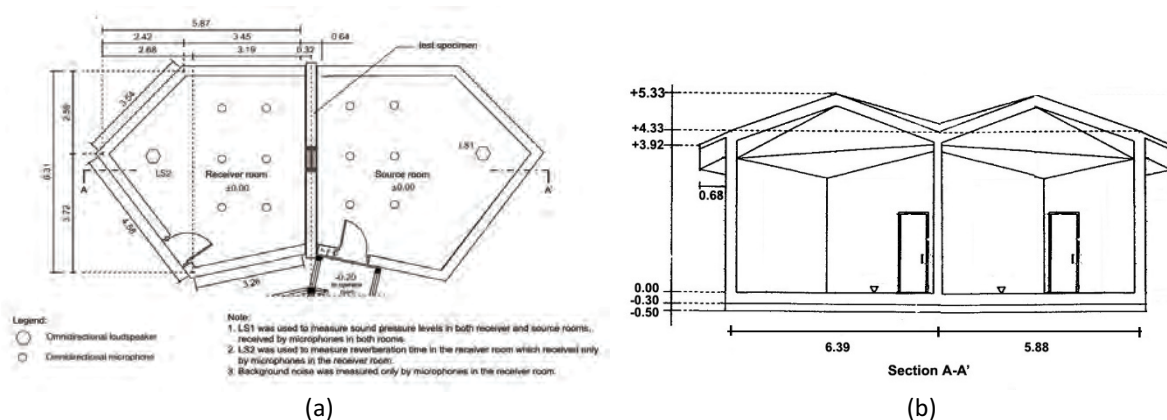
Plan of the testing rooms and the equipment layout (a) and section (b).
